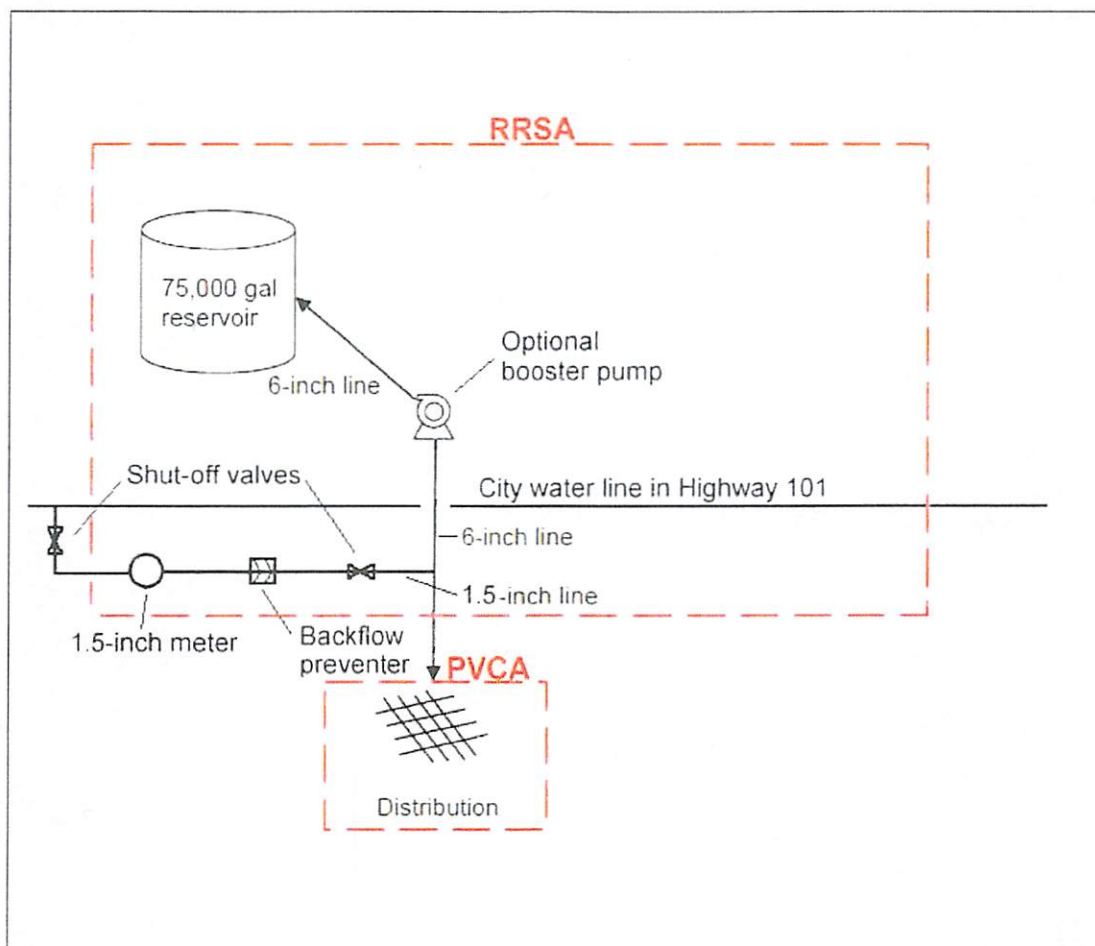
Conceptual Layout for RRSA Connection to City Water
